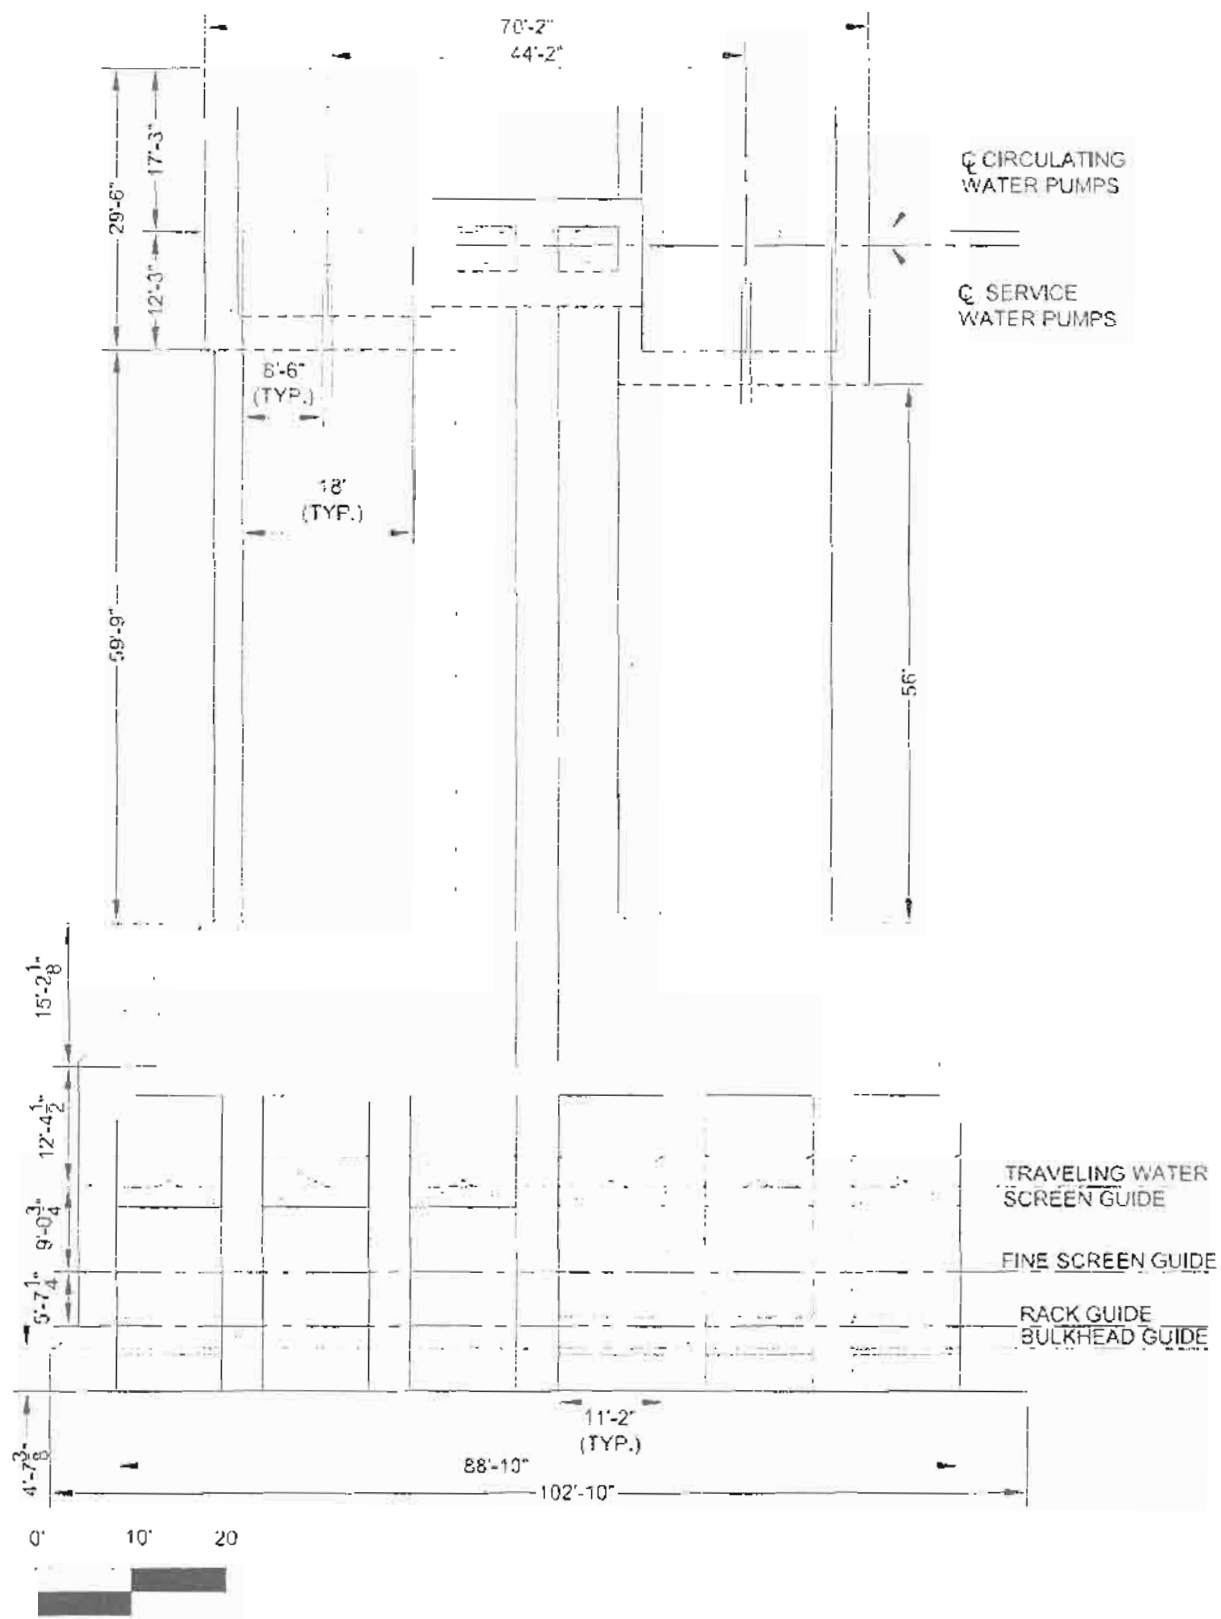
Ravenswood Generating Station Unit 30 CWIS – Plan
